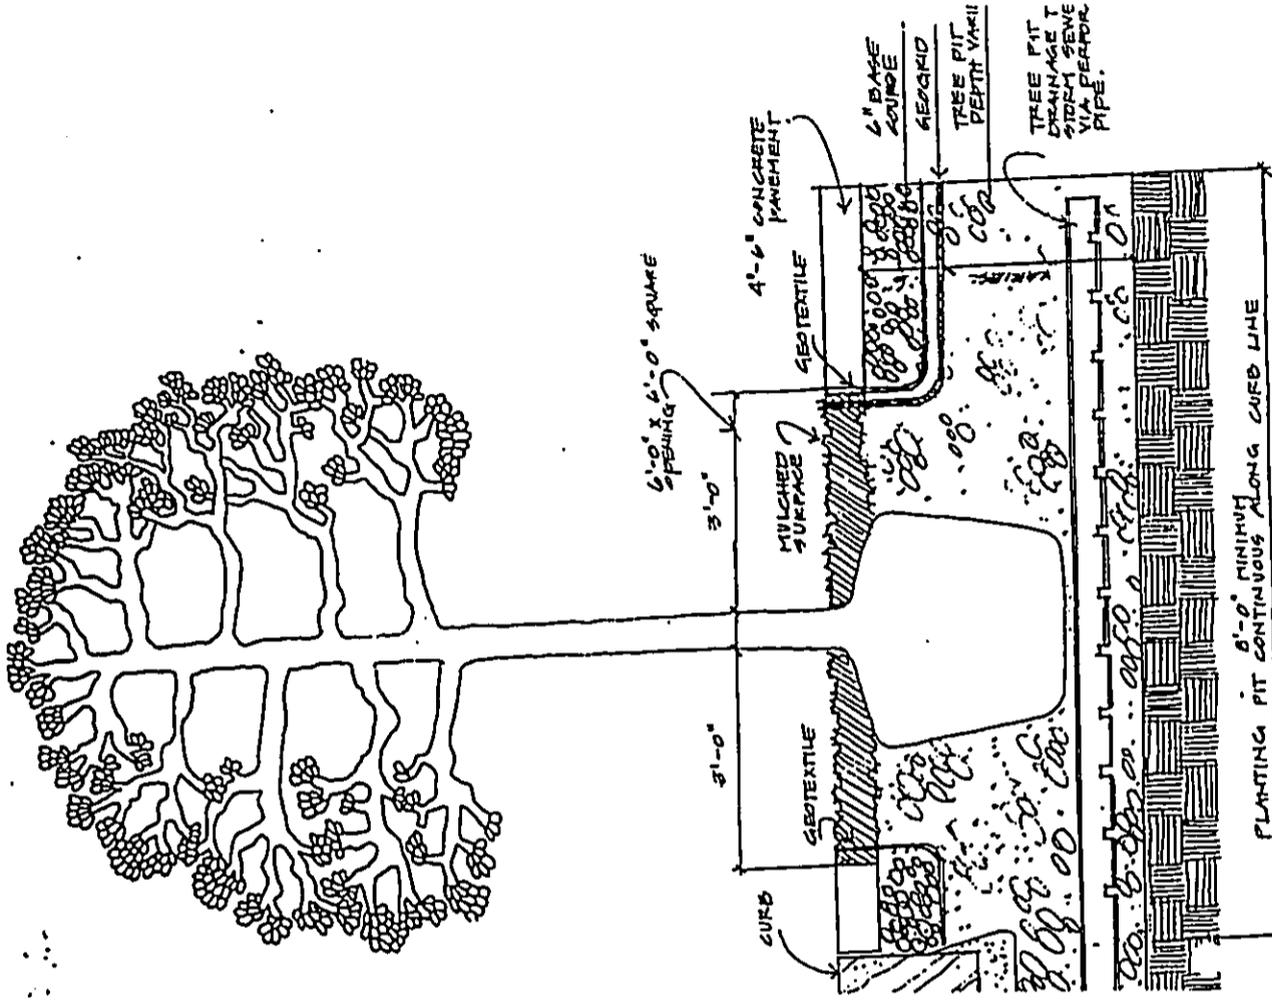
Elevation plan of a proposed structural soil pavement profile using the sub-base as the rooting zone.
